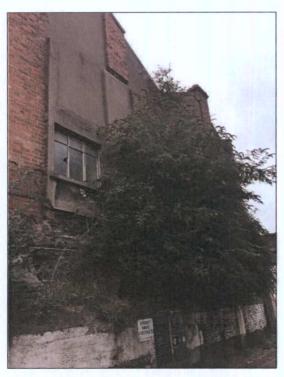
Detail of render repairs to side (east) elevation, facing northwest.
